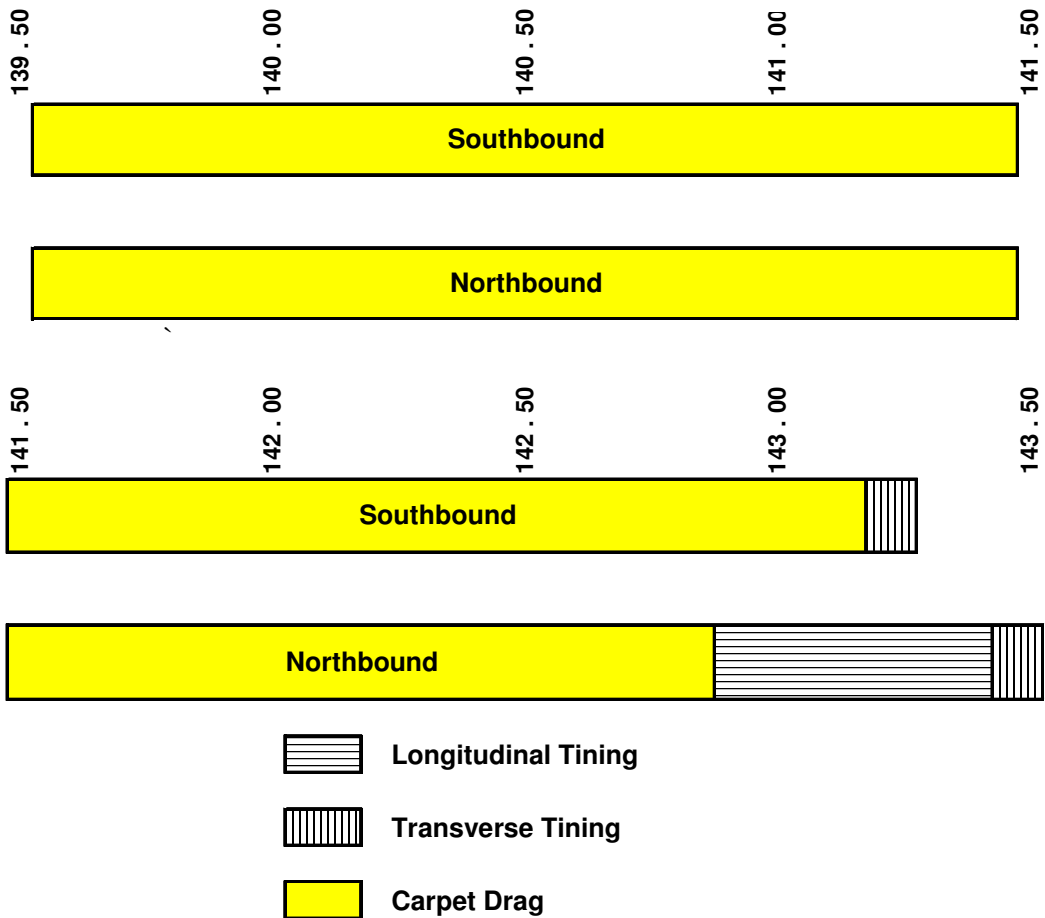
Location of the longitudinal tining, transverse tining and carpet drag sections.
